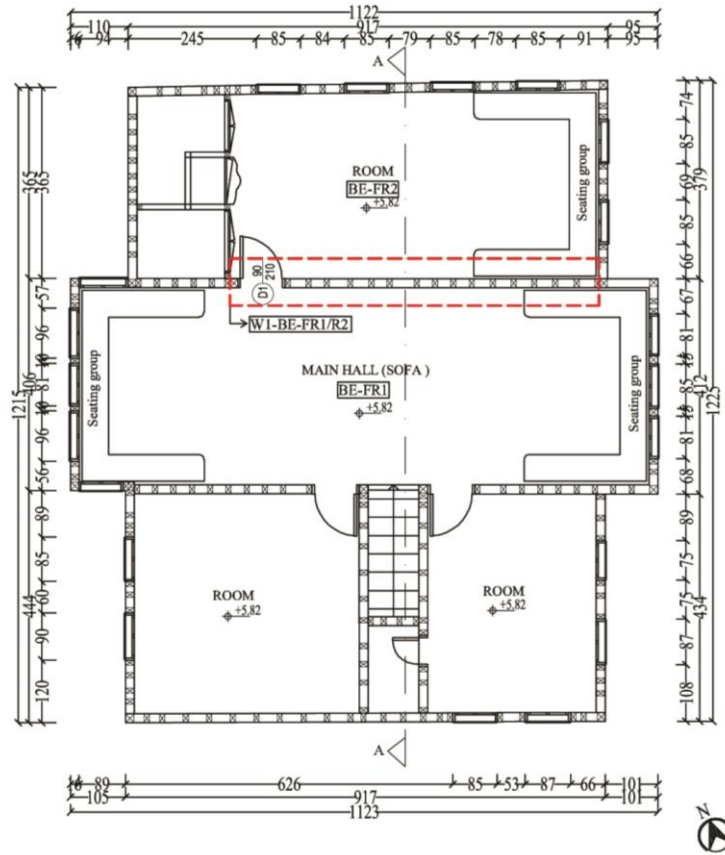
First floor plan of Ankara Bağ Evi in 1/100 scale (Redrawn by author).
